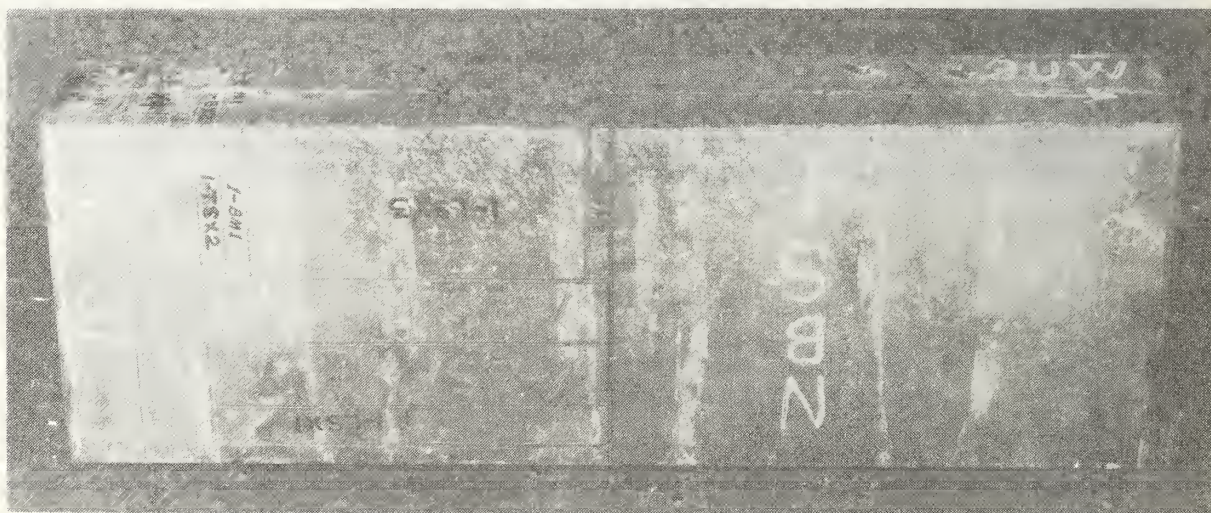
Location of test specimens from box beam segment 9U obtained from the walkway debris.
